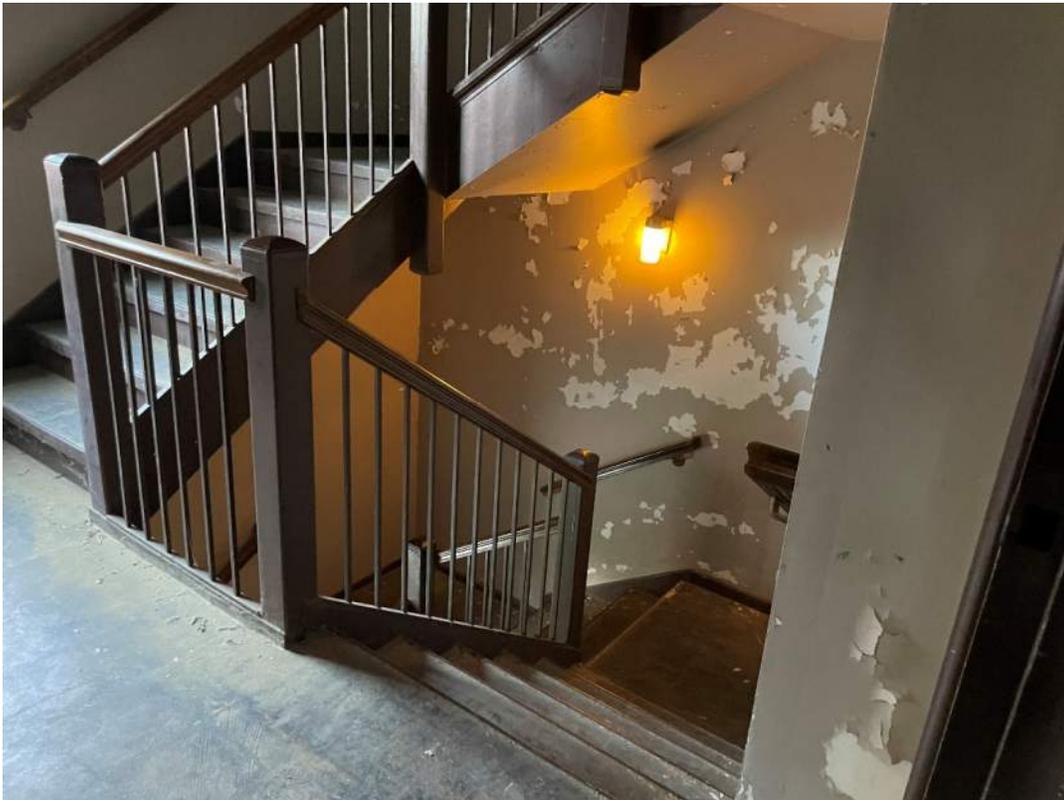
Retreat Building. First floor stairwell down to basement. Peeling paint.
